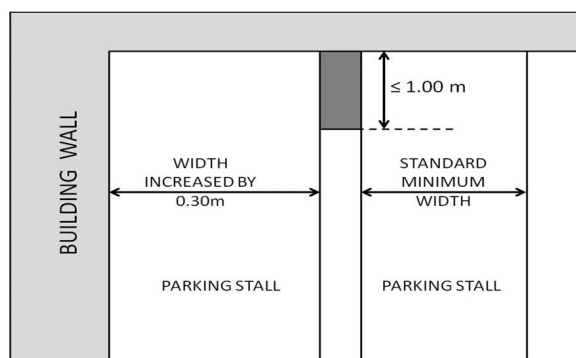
Illustration of when parking spaces must be increased due to an adjacent structure, as shown in the Town of Comox Zoning Bylaw Figure 6-2. Increased Parking Space Width
